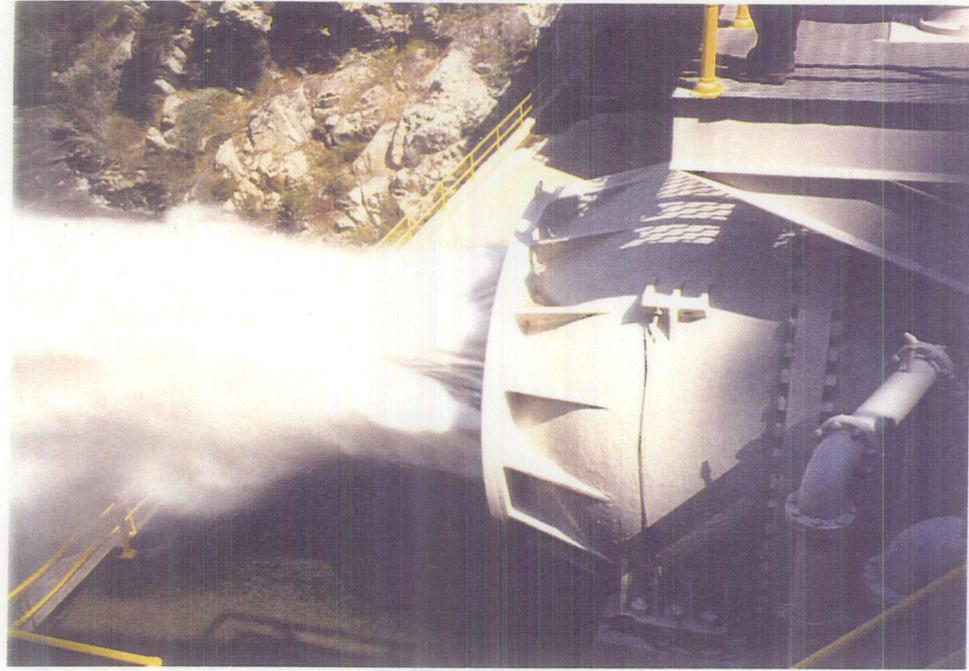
Morris Dam - Needle Valve 6 - View showing needle valve discharge at full head.
